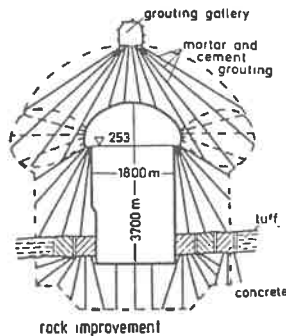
Applications of grouting in tunnel construction (after Kutzner and Schetelig, 1985)
